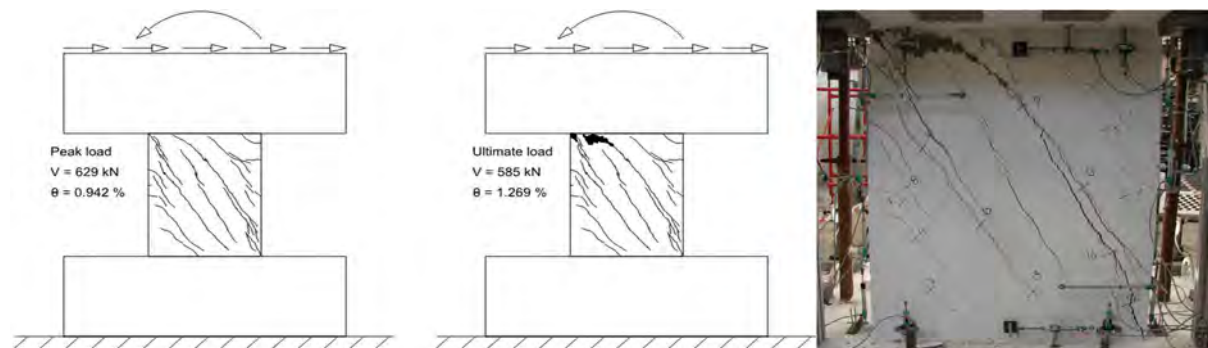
Crack diagrams of specimen RB2: at peak load (left) and failure (middle). RB2 specimen's post-test photo (right)
